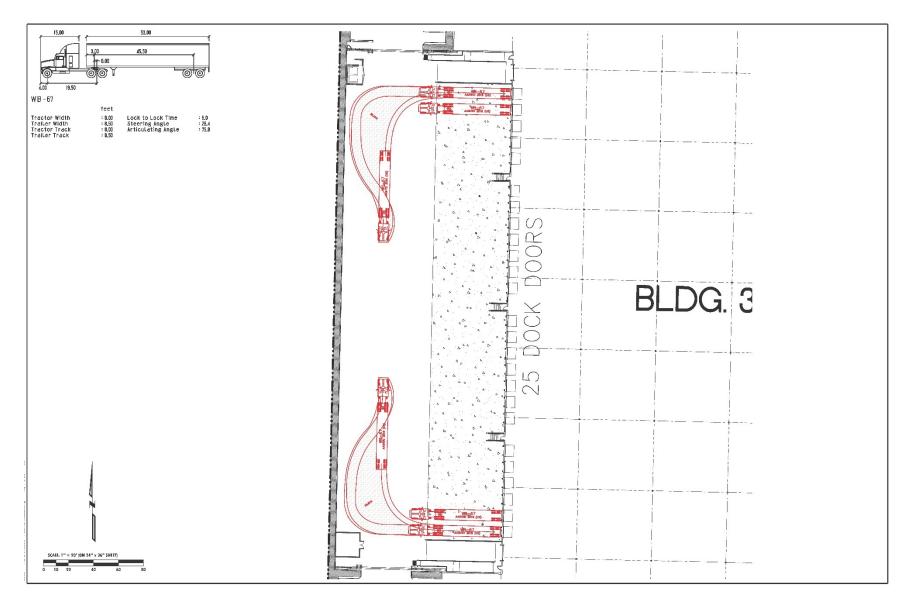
OUTBOUND ON-SITE TRUCK CIRCULATION VIA DRIVEWAY 2
